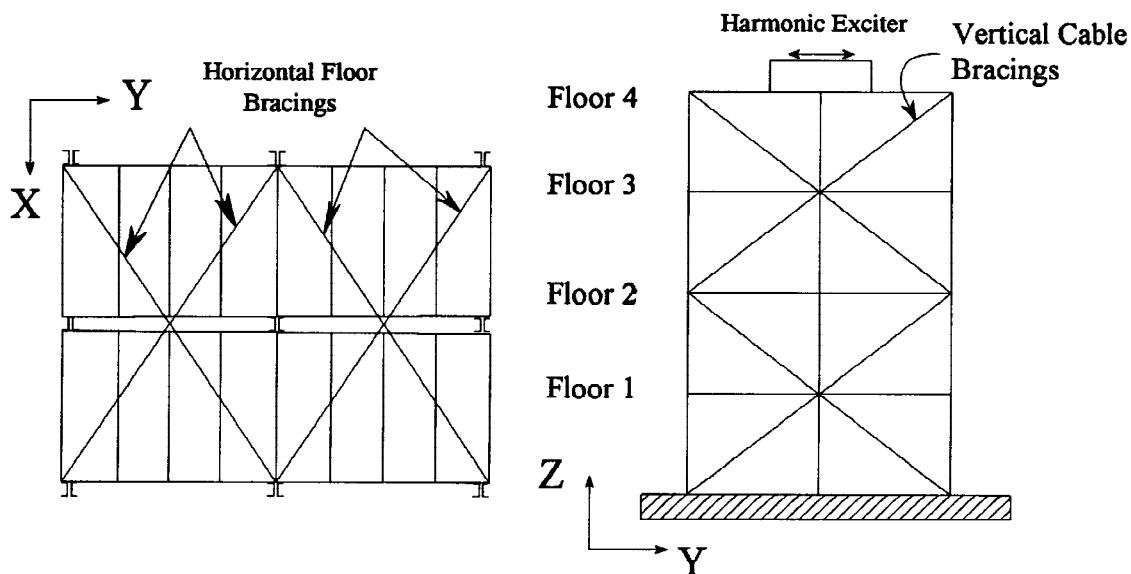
(a) Horizontal floor bracings, and (b) vertical X-bracings of frames 1 and 3
